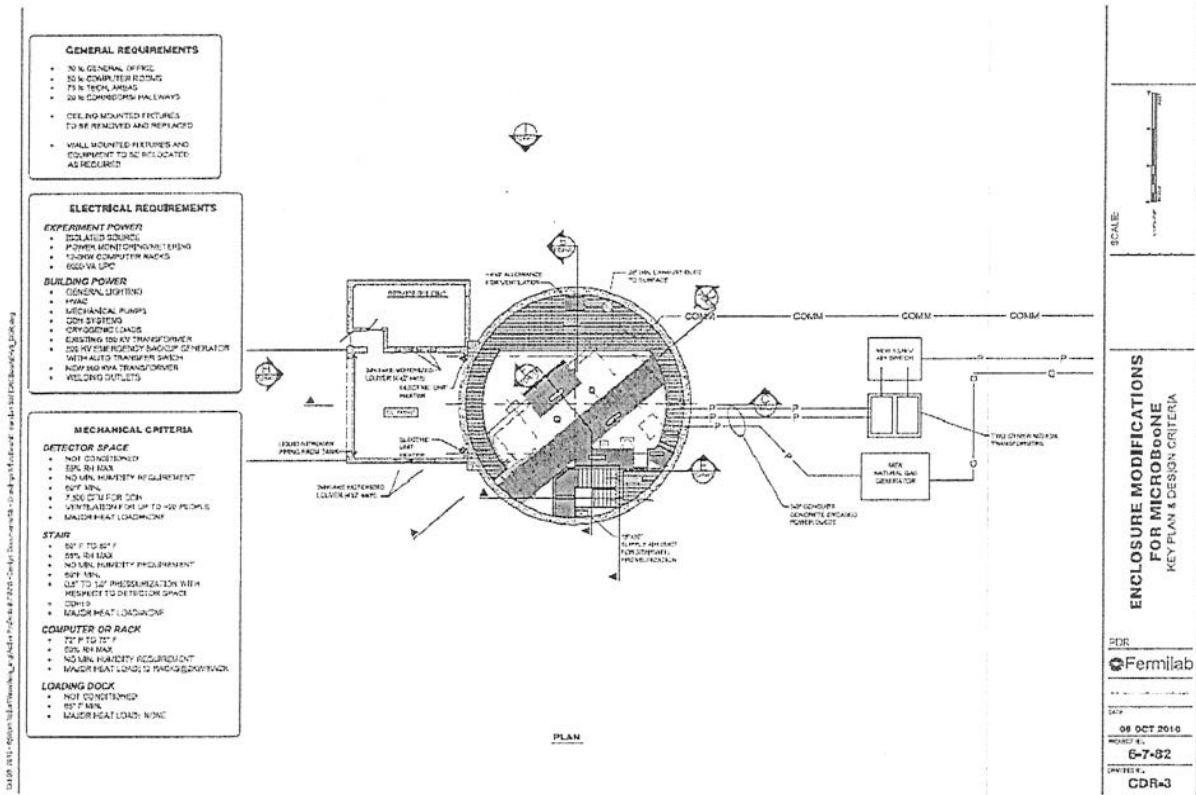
Plan view of the “cylinder and shed” facility showing the loading dock area, electronics room, and cylinder with stair column.
